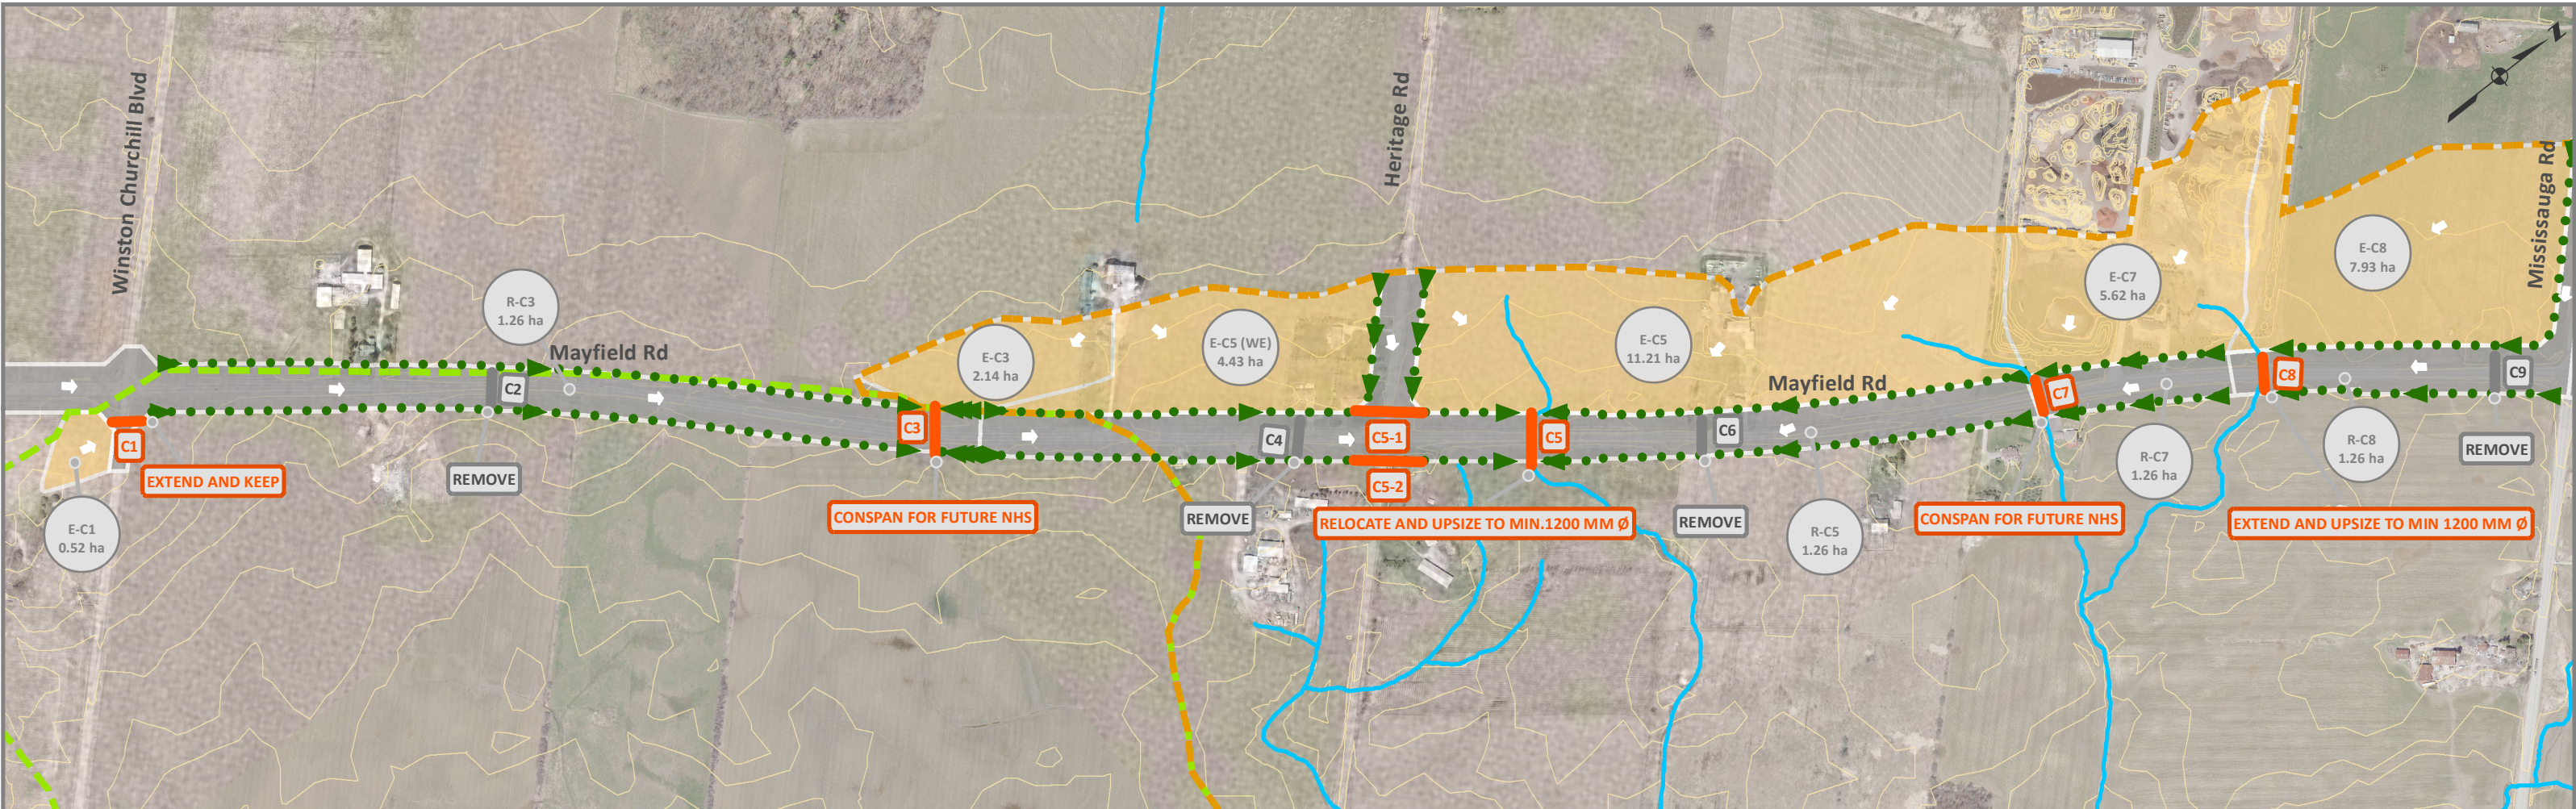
shows the proposed external and road sub-catchments and proposed consolidated drainage culvert crossings/outlets.
